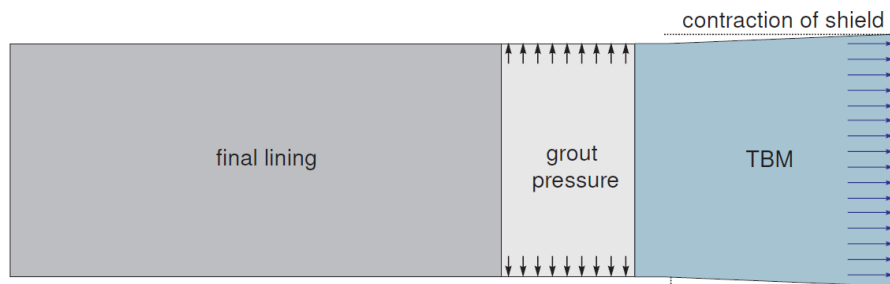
Sketch of a tunnel excavation process (Plaxis 3D Manual).
